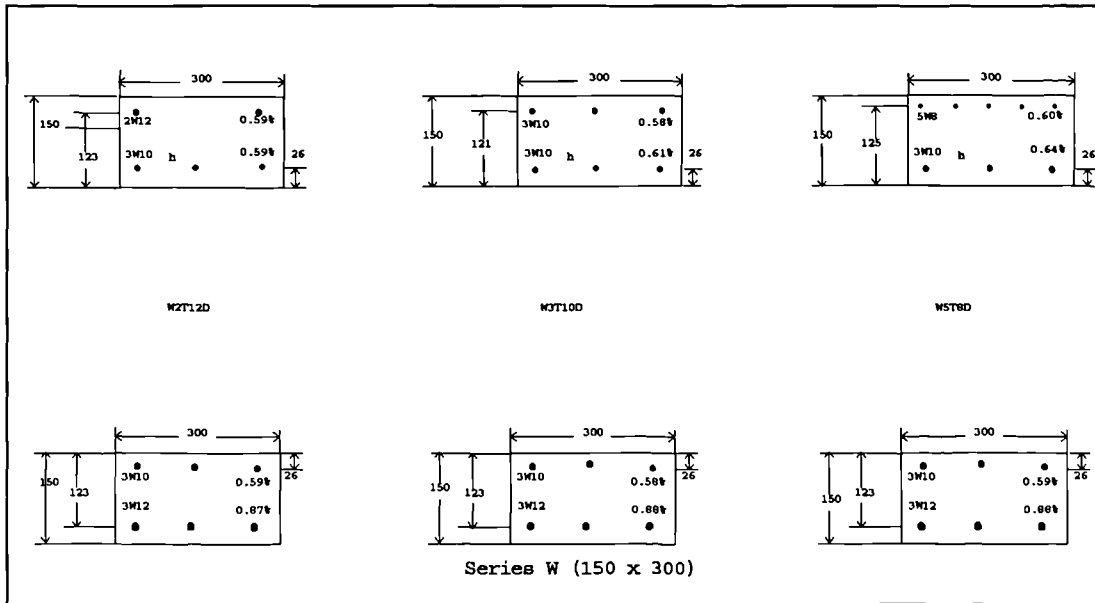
Series W test beams dimensions and reinforcement layout.
